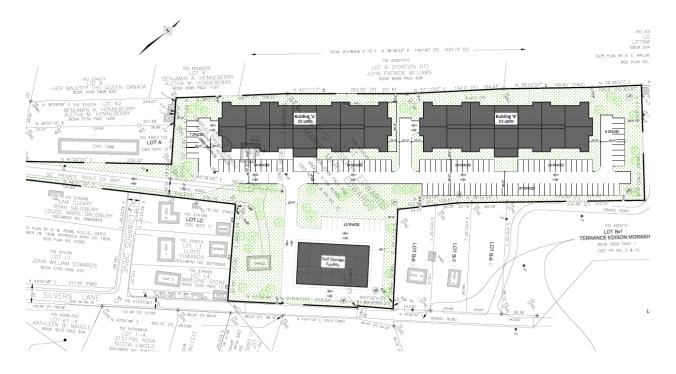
Lands of Garmar Investments Limited Proposed Site Plan
